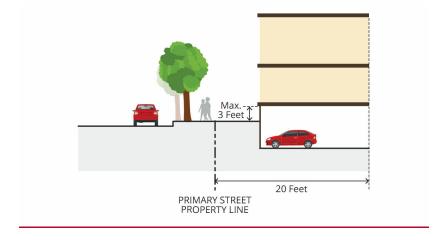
H UNDERGROUND AND TUCK UNDER PARKING, MAXIMUM ABOVE GROUND HEIGHT
